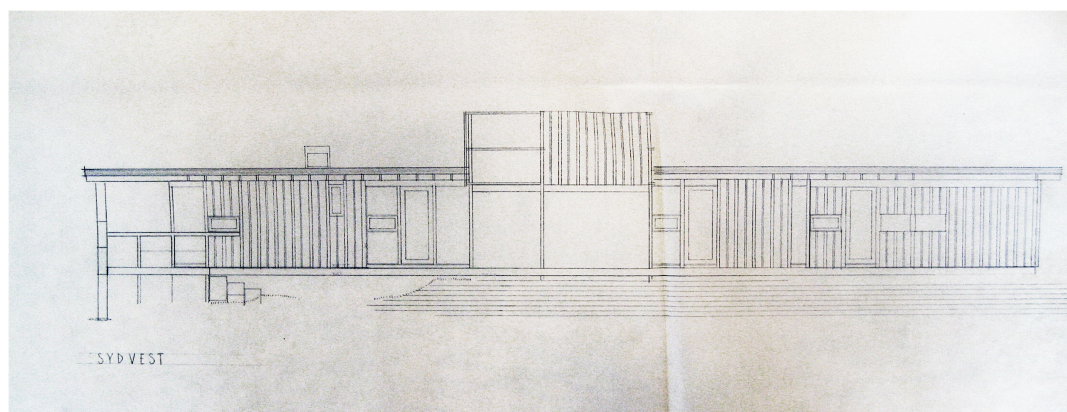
Are Vesterlid. *South-west façade from the Nordic Villaparade.* (08.01.1963)
